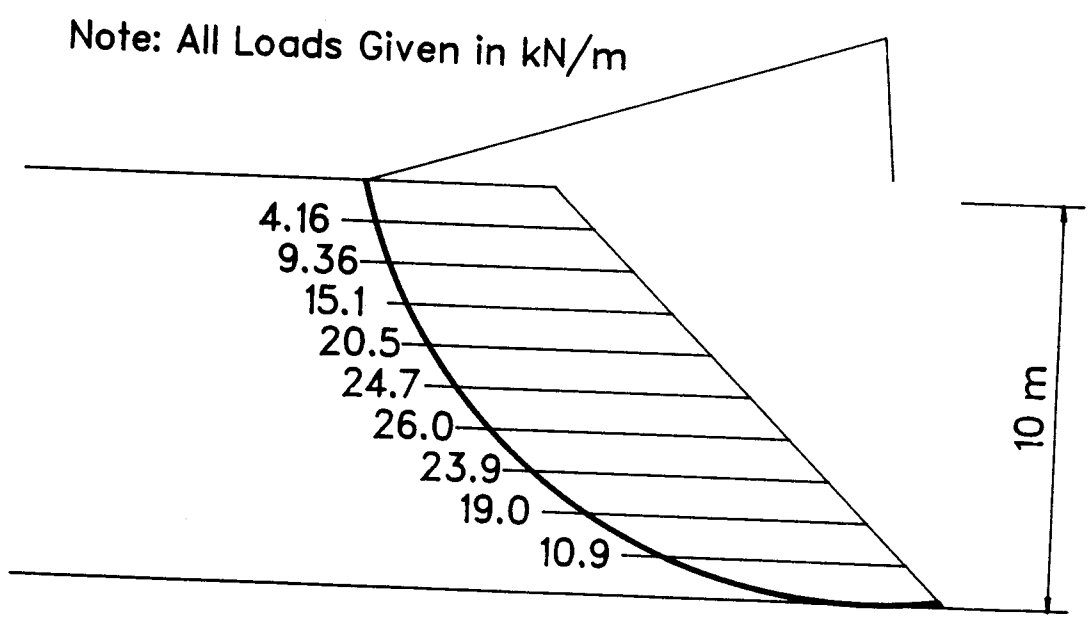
Potential Reinforcement Load Distribution for a Slope Height of 10 m
